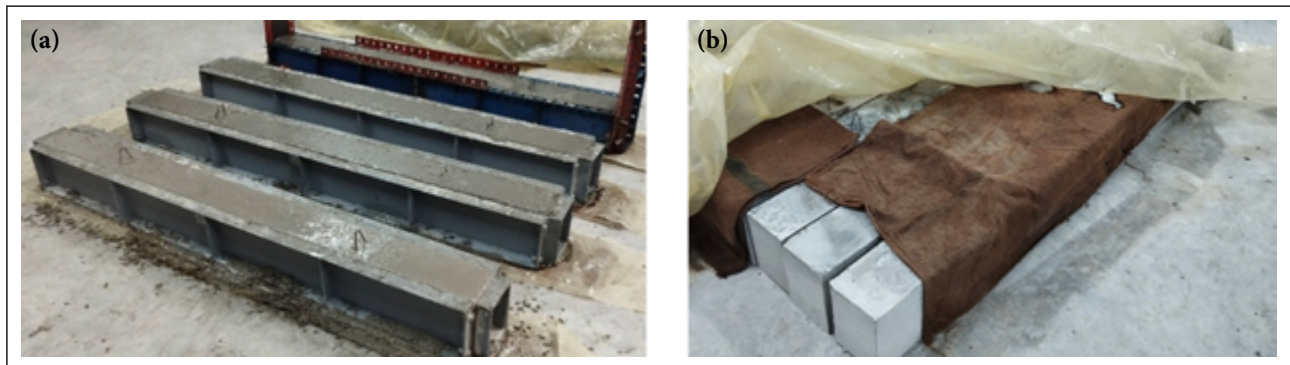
Beam molded and curing. (a) Beam molded. (b) Curing.
